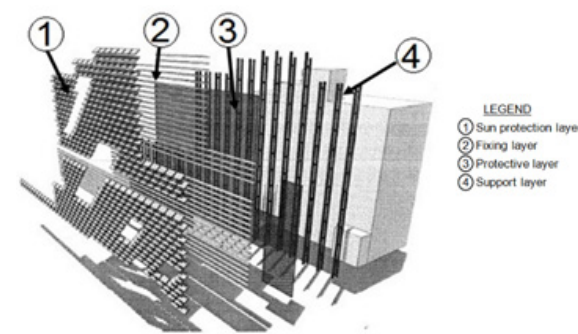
Proposal of a four layer curtain wall in order to work together with the building facade
